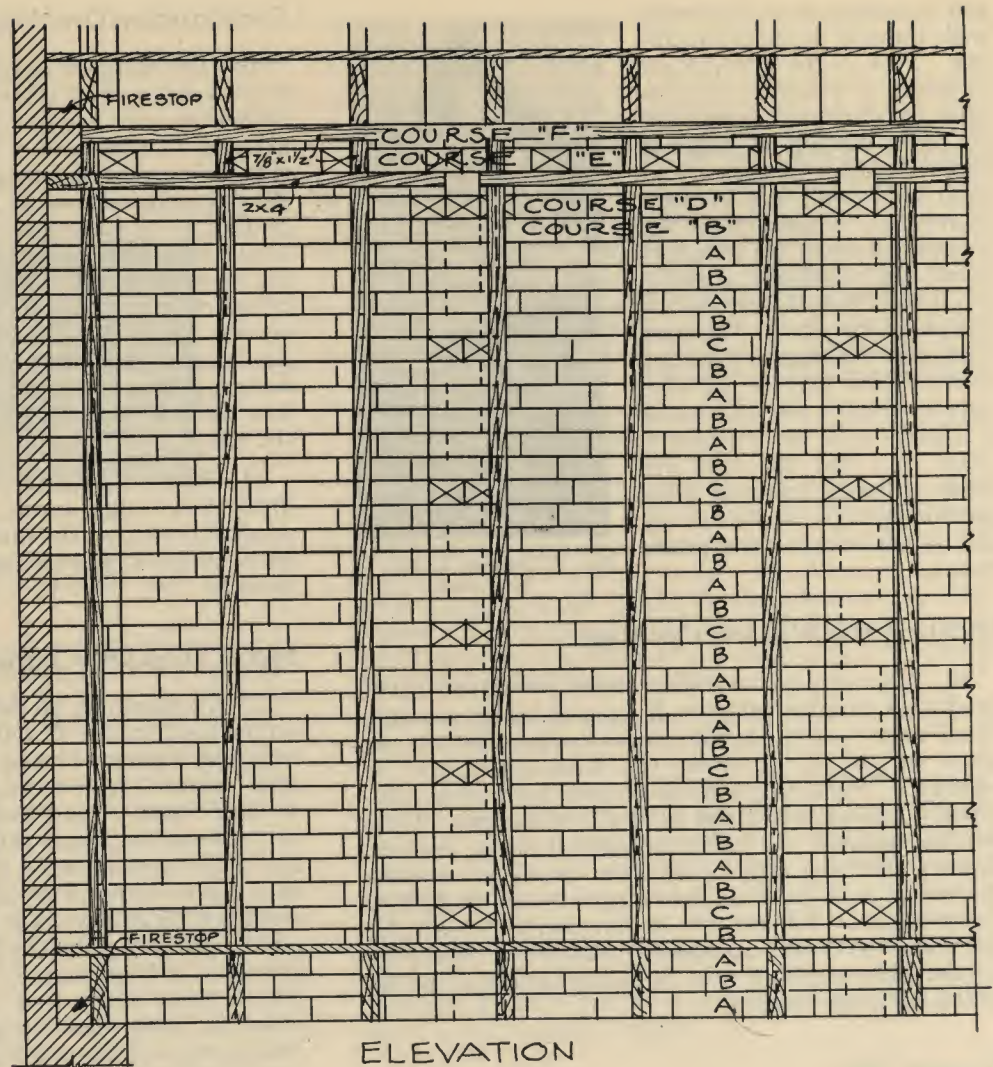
Typical interior elevation of wall with back-mortaring omitted, showing application of furring strips. For plan of lettered courses see Fig. 4
